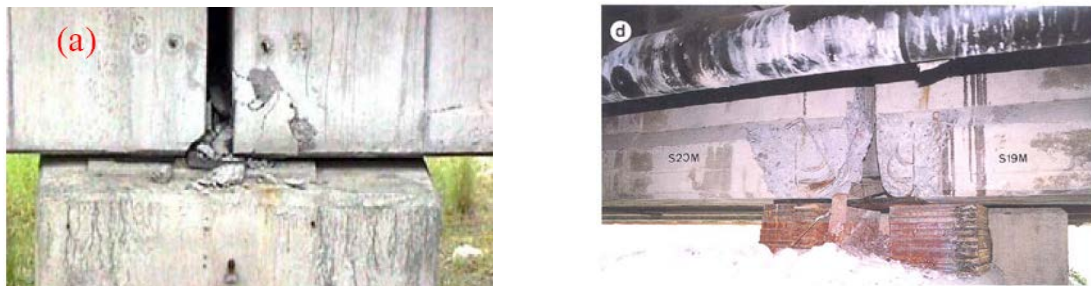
Typical pounding damage between bridge decks in Chi-Chi earthquake
